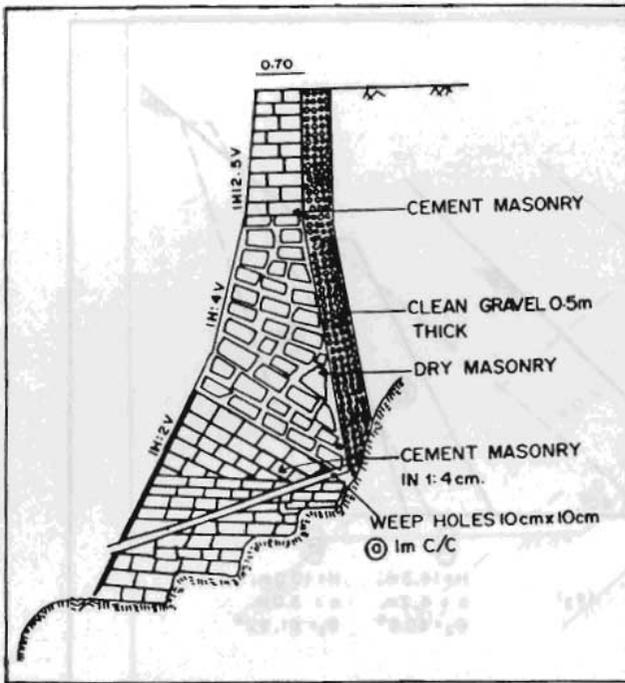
A Composite wall (consisting of dry masonry and cement masonry) is suitable and economical whenever the foundation is sound.
